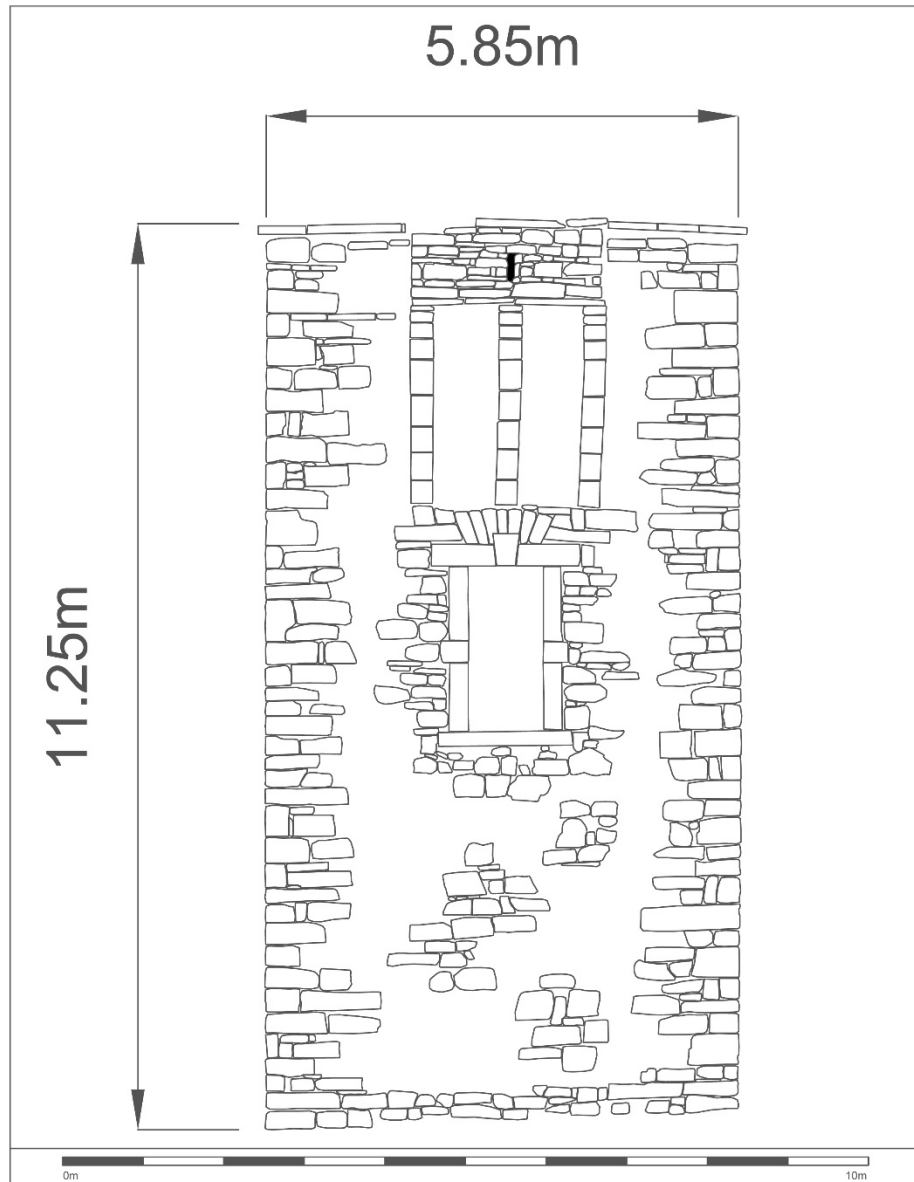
External elevation of the north wall signal tower at Carrowmably Signal Station. The gun-loop on the machicolation is shaded black.
